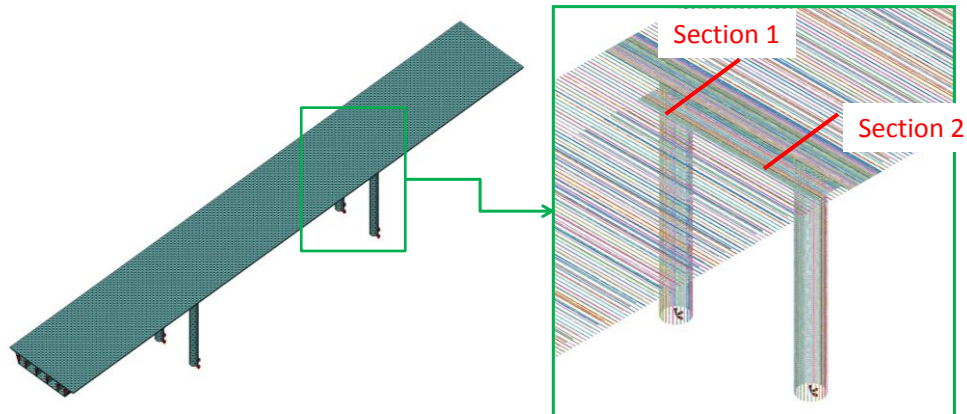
Typical full bridge FE model: concrete solid element mesh (left) and embedded reinforcement with identified bent cap critical bending moment sections (right)
